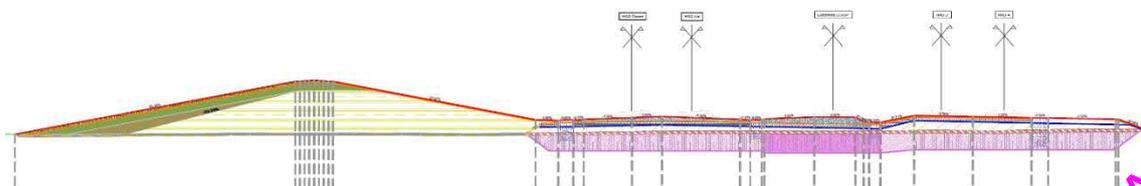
Cross Section of Twyford Embankment at Ch.HS2 81+140
